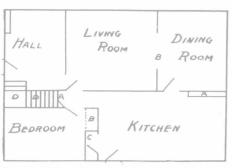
Either this plan or the one above may be used with upstairs shown in fig. 3. If a large kitchen is preferred, use this plan, and place built-in cupboard near dining-room door.
